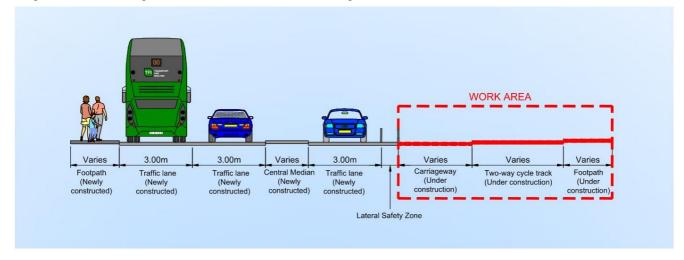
Traffic Management Cross Section, Section 3b – Stage 3
